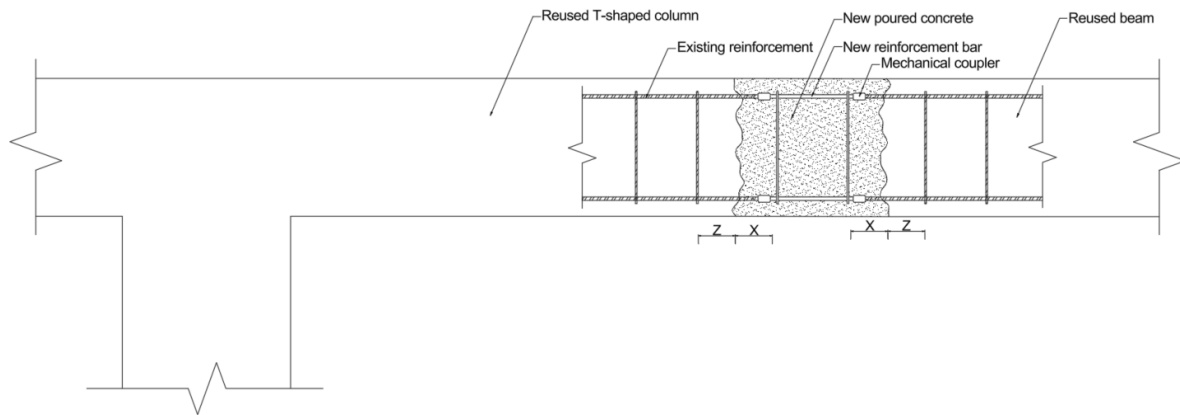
Design proposal of the reused T-shaped column-beam connection
